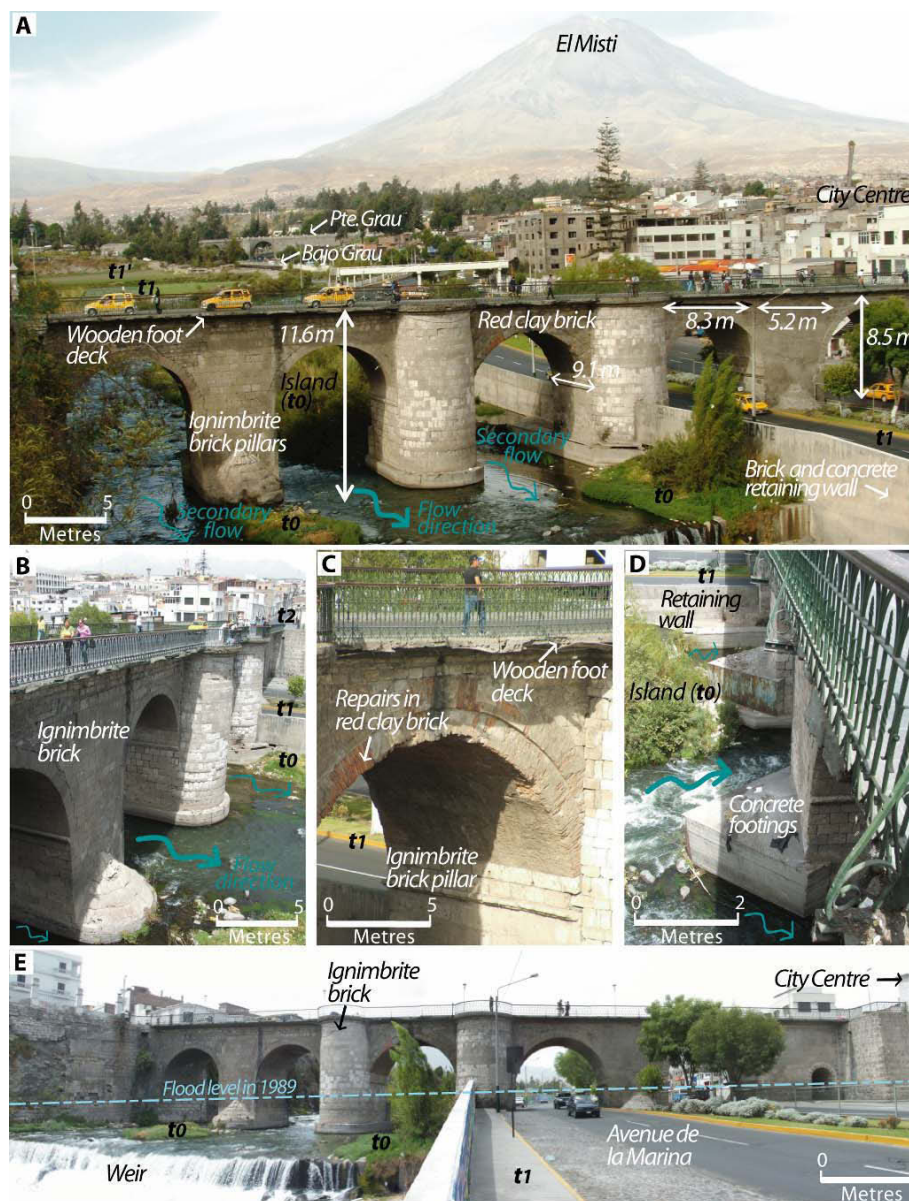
A: Downstream view of the bridge and its five arches over the river and highway. B: Downstream view of the bridge. C: Damage and poor repair of the river arch closest to the road, and the uneven footpath which is constructed from wood. D: The large pillars of the upstream side of bridge. E: Downstream view of the bridge at road level, the weir is on the left side of the photograph.
